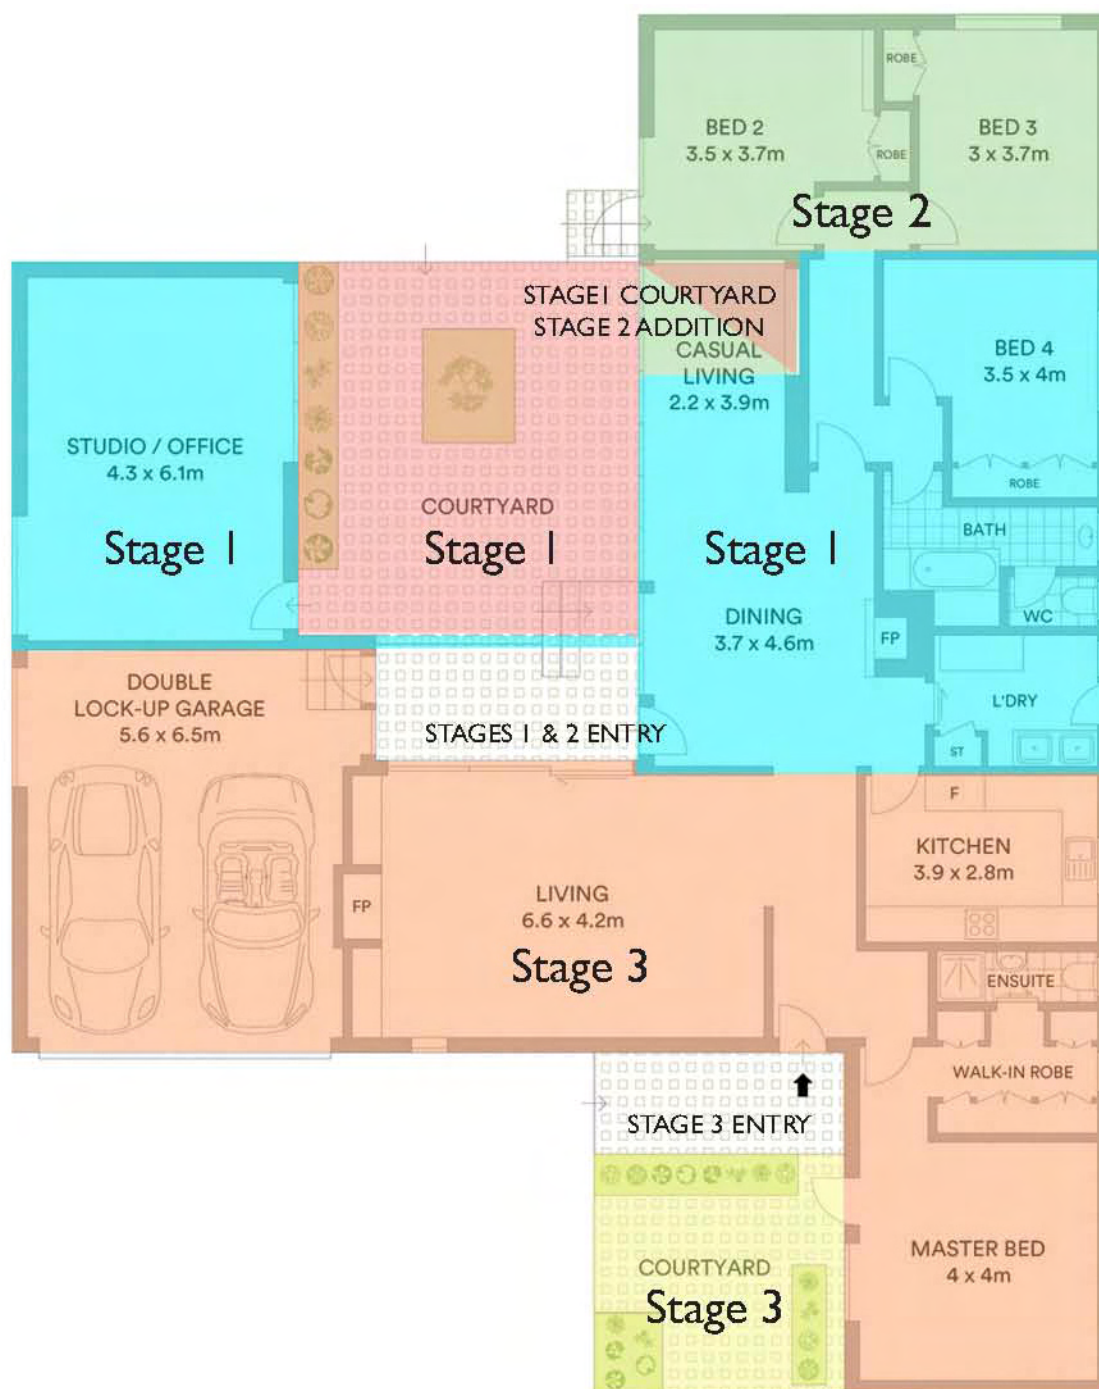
Floor plan illustrating the three stages of the construction of the house: Stage 1 1952, Stage 2 1955, Stage 3 1968.
